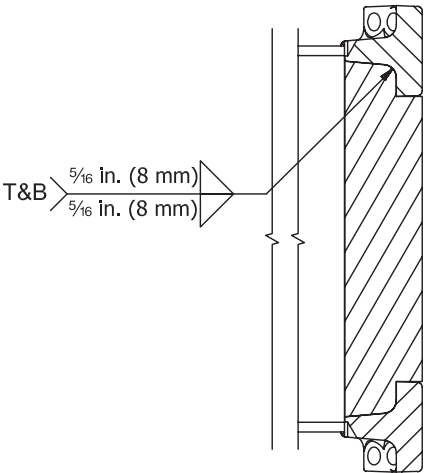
Collar web extension-to-collar flange welds, elevation.
